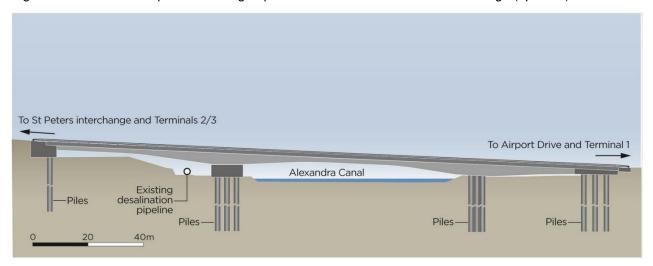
Preferred balanced cantilever concrete bridges for the Terminal 1 connection bridge
